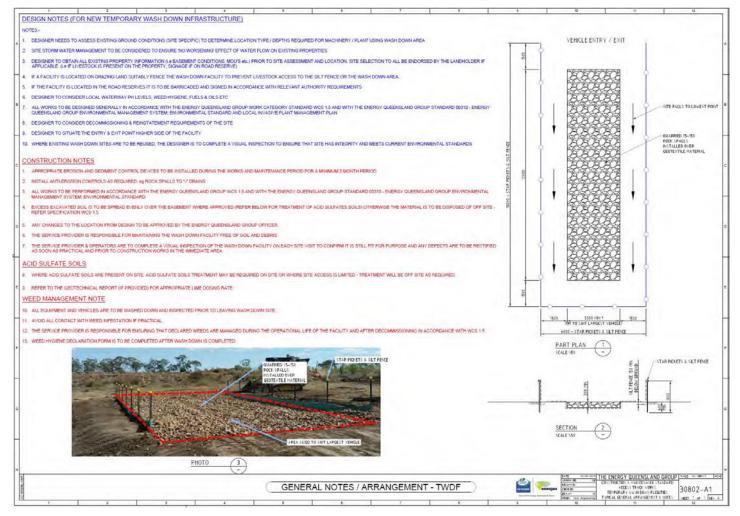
Access Track Infrastructure – Temporary Wash Down Facilities – Construction and Maintenance Details.
